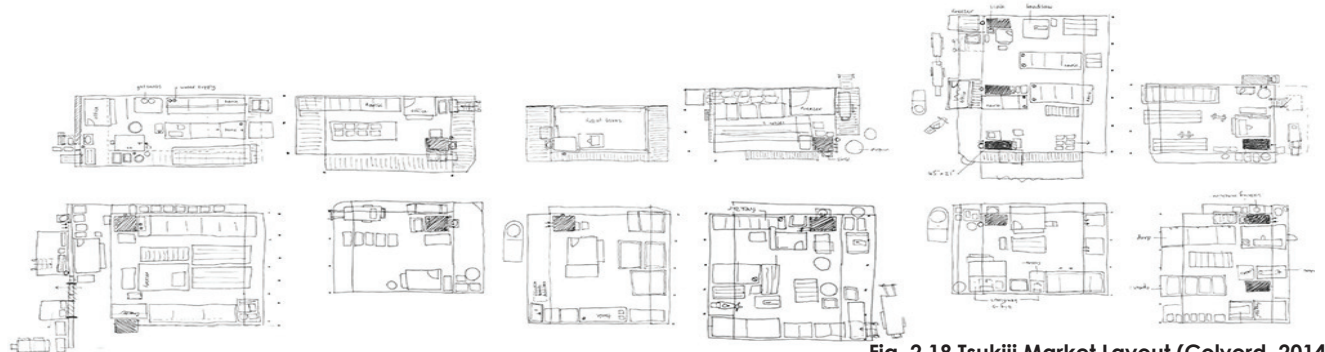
Tsukiji Market Layout (Colverd, 2014)
